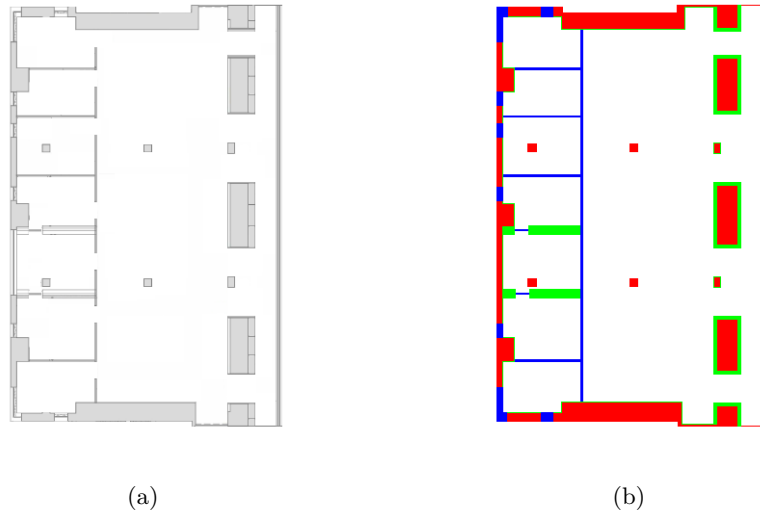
Floor plan with materials: (a) Raw floor plan; (b) Floor plan with materials.
